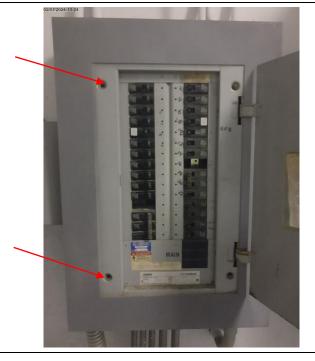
Item 7.28.b. Level Roof. Mechanical Room. Panelboard RL. Misssing screws.
